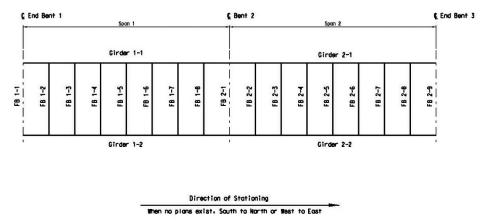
Girder and Floor Beam Plan View Labeling Convention
